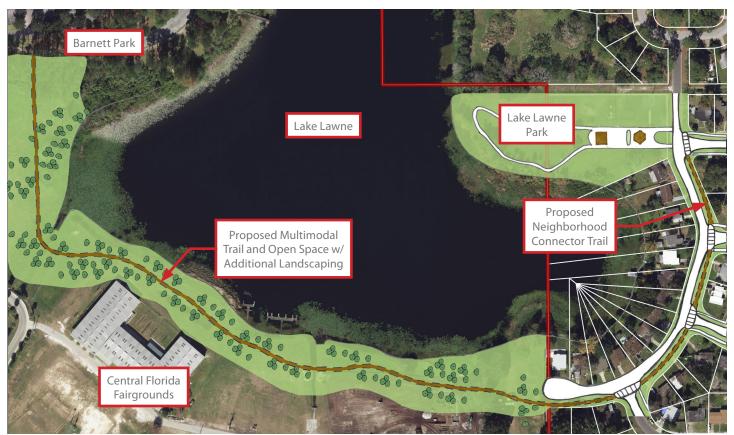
Conceptual site plan illustrating a trail connecting the study area to Barnett Park.
